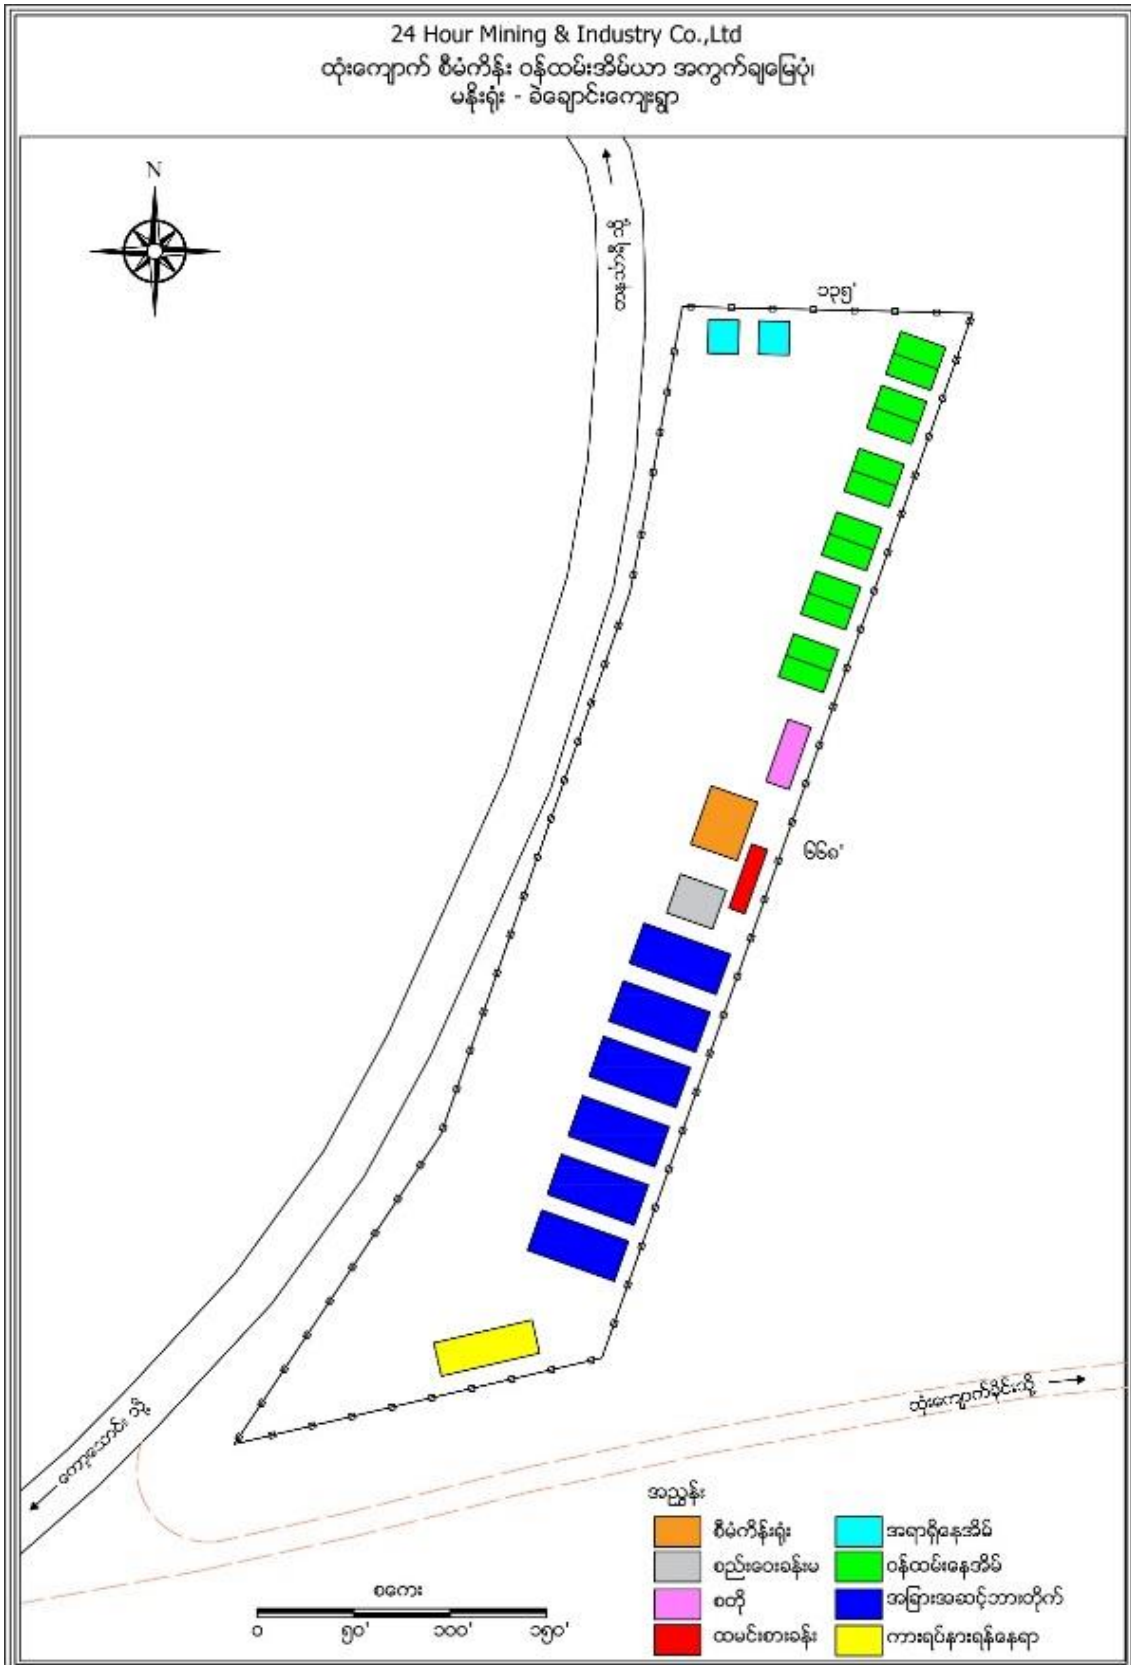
Site Layout Plan for accommodation for Project staffs and workers
